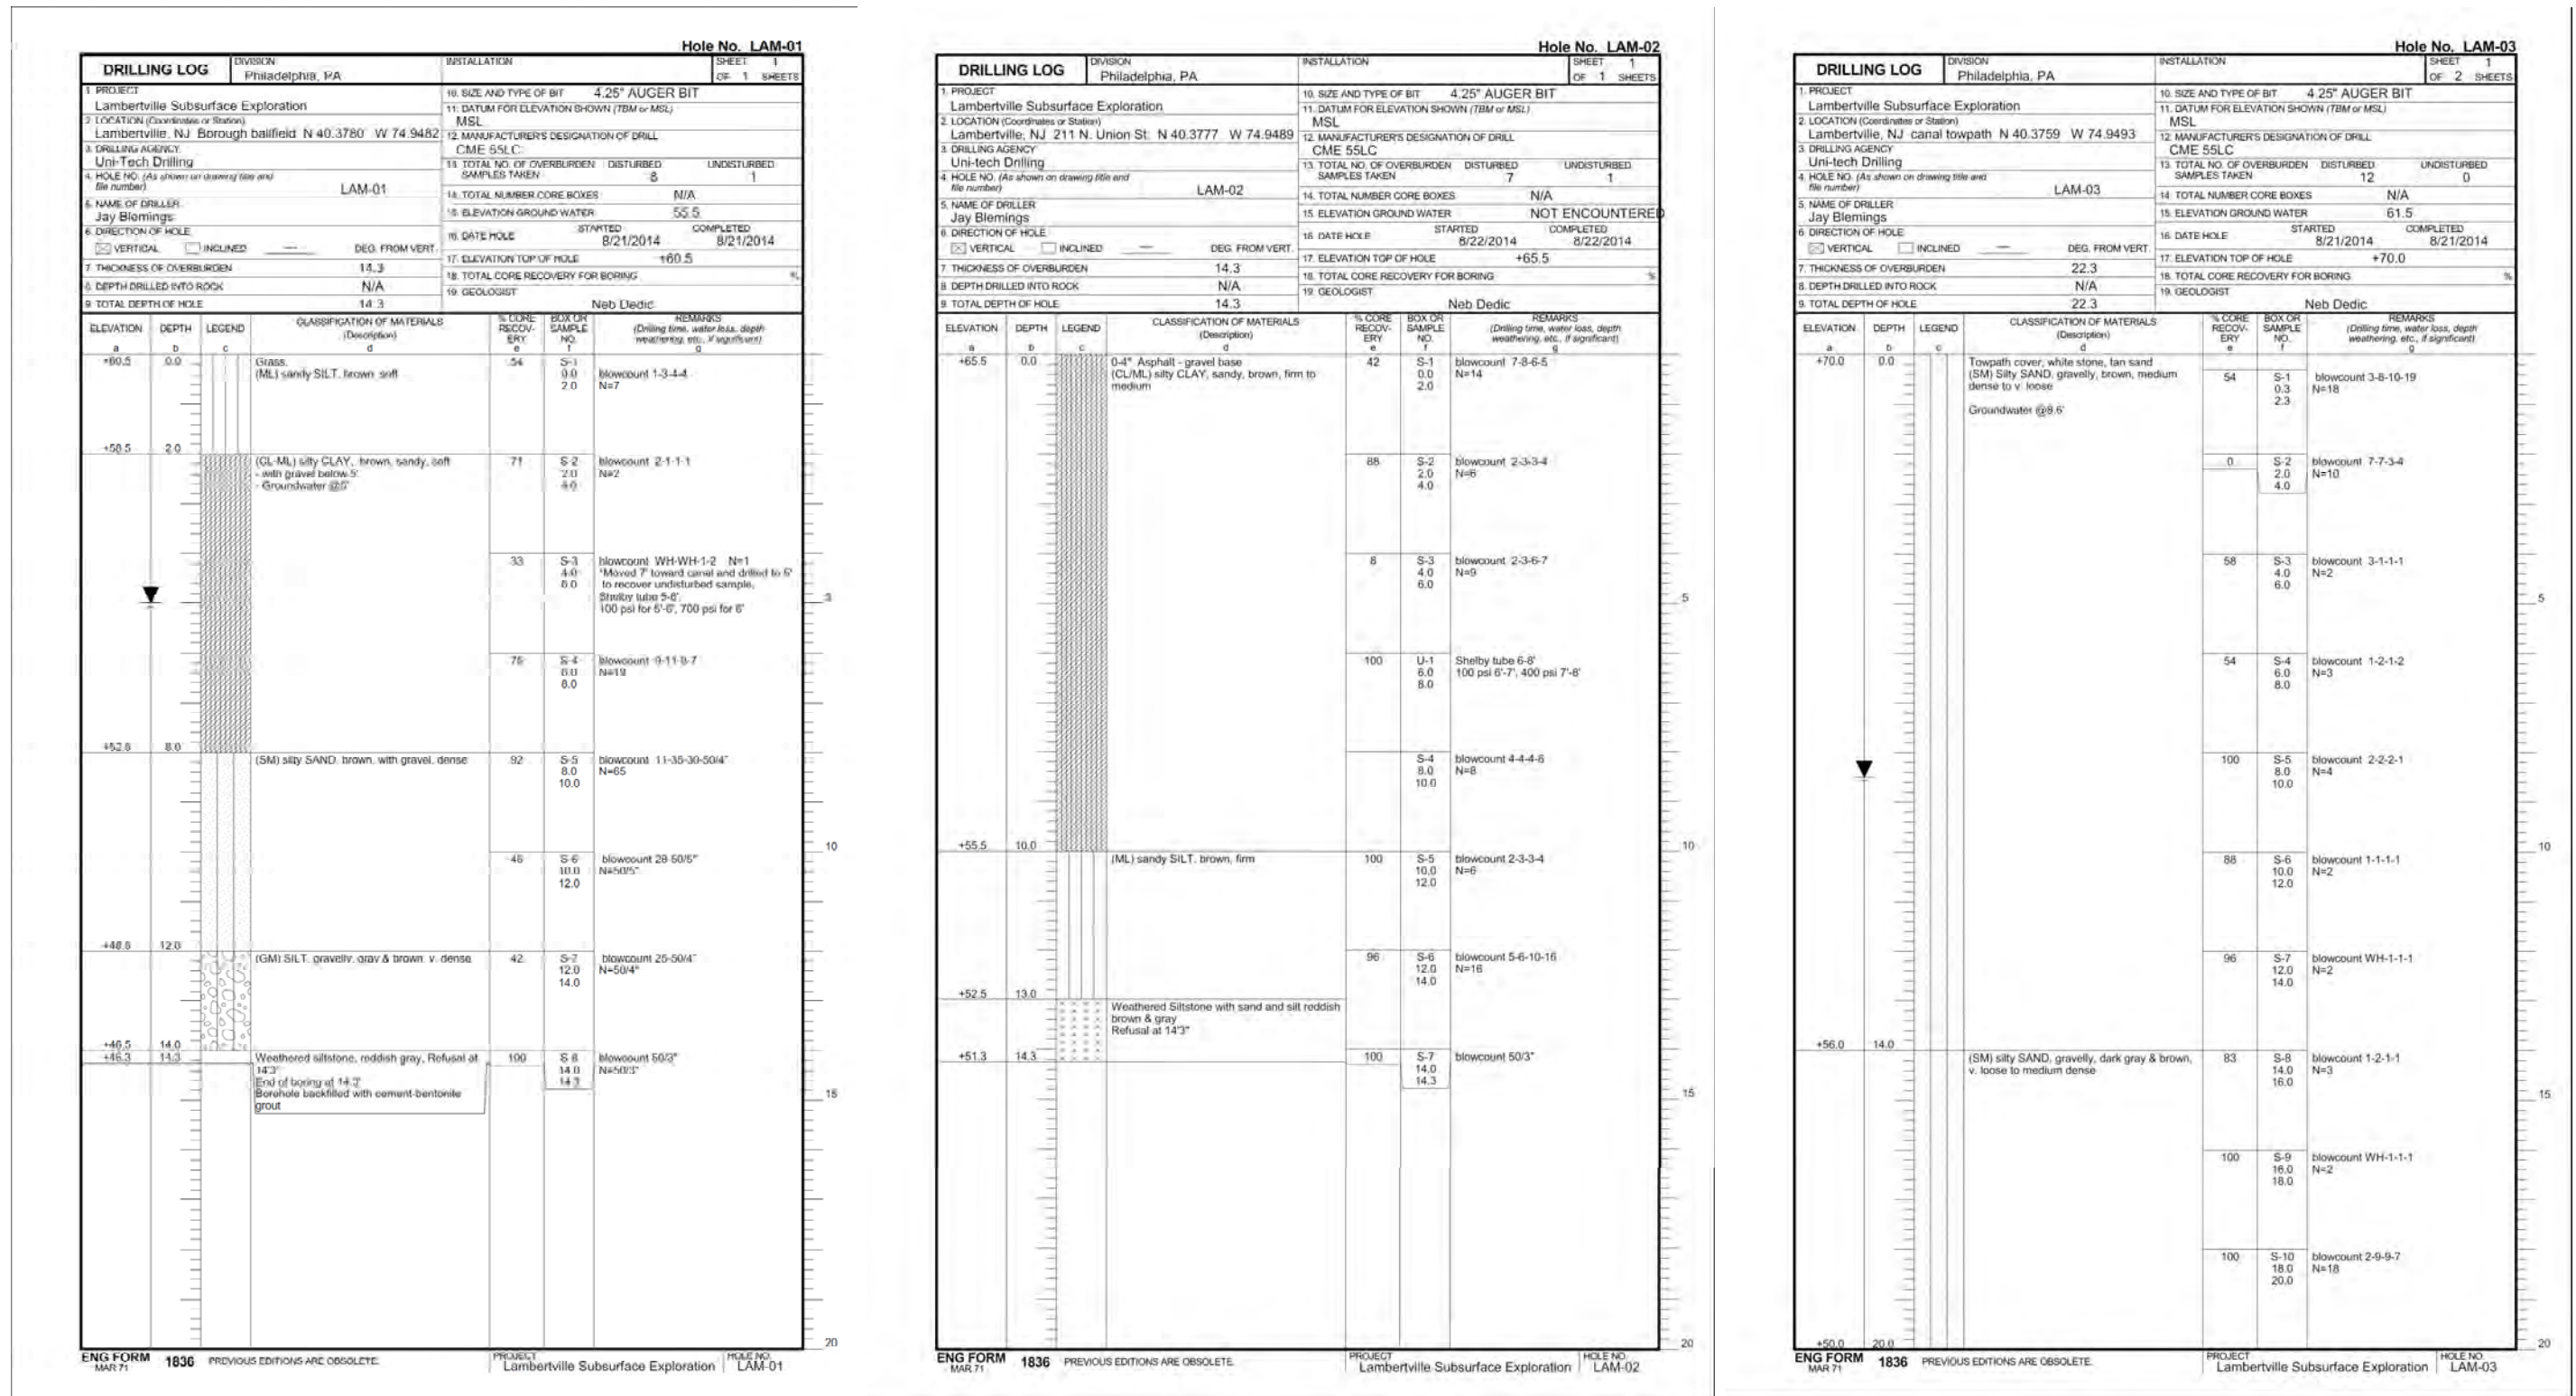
Geotechnical Subsurface Exploration, Lambertville, New Jersey – Test Boring Logs
